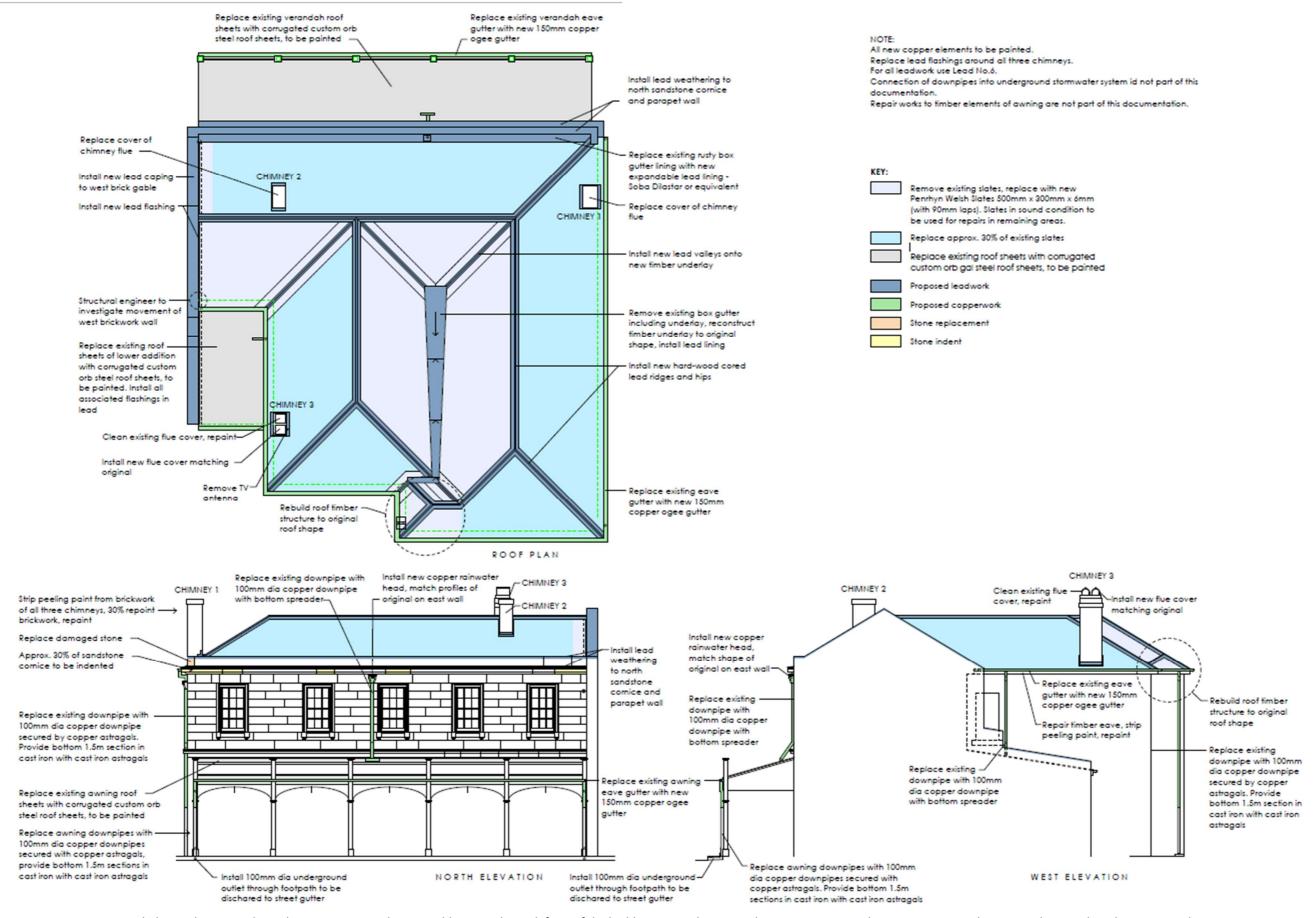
Recommended remediation works to the George Street Shops to address condition defects of the building. Remediation works to stormwater and sewer systems, and repair works to timber elements not shown. Source: OCP Architects 2024.
